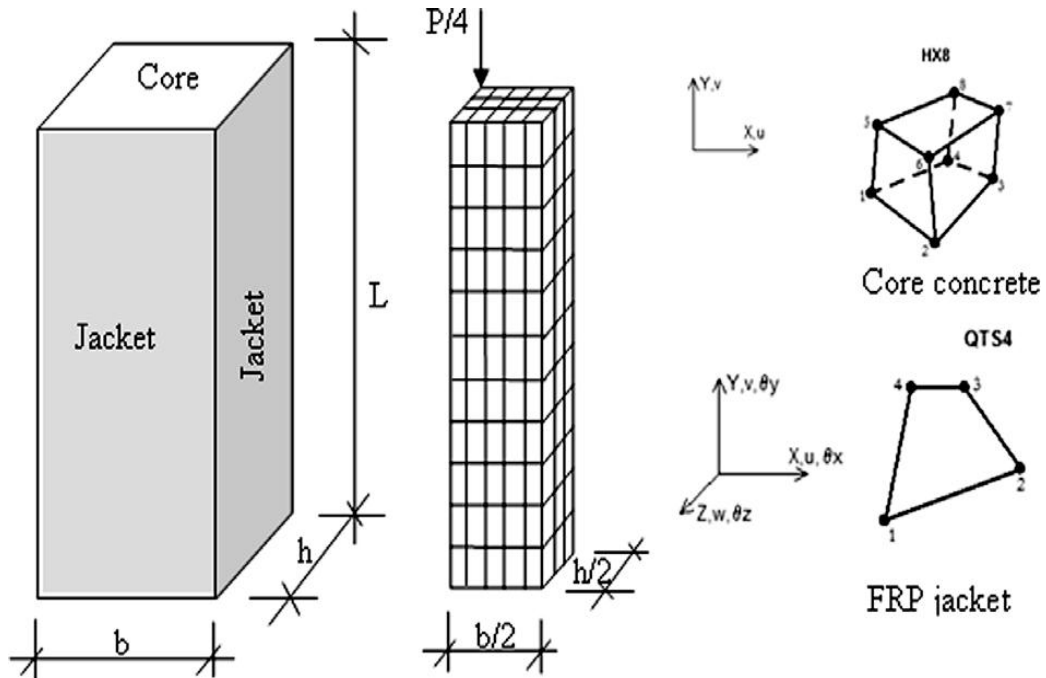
Modelling the axial force on confined column using FRP wrapping in finite element (Koksal et al., 2009)
